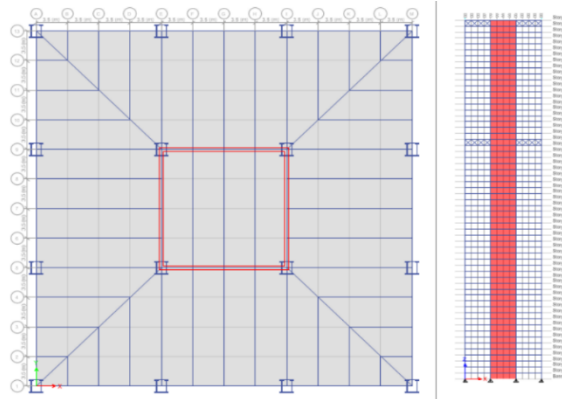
Typical Floor Plan and Sectional view (Outrigger System)
